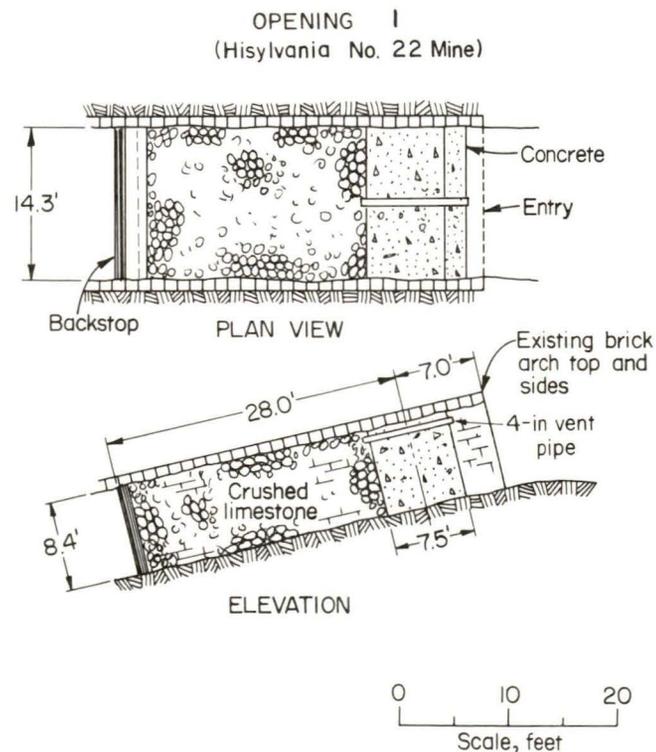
Plan view and elevation of sealed opening at Hisylvania No. 22 Mine, opening 1.
